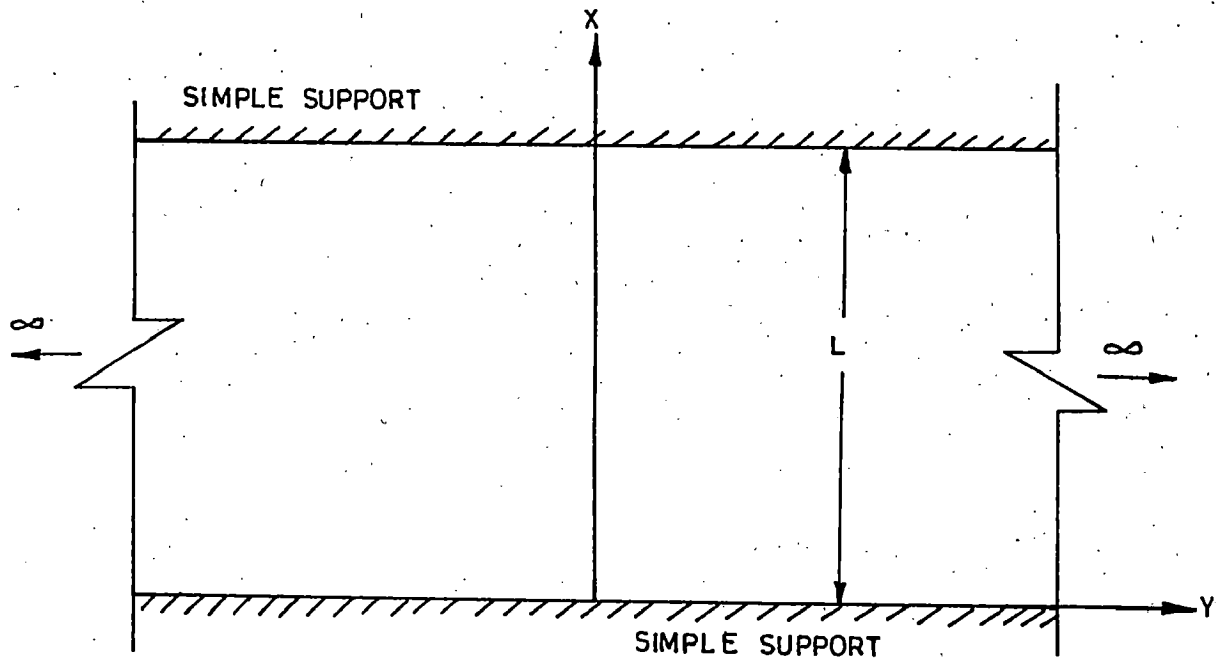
BRIDGE DECK OF INFINITE WIDTH
